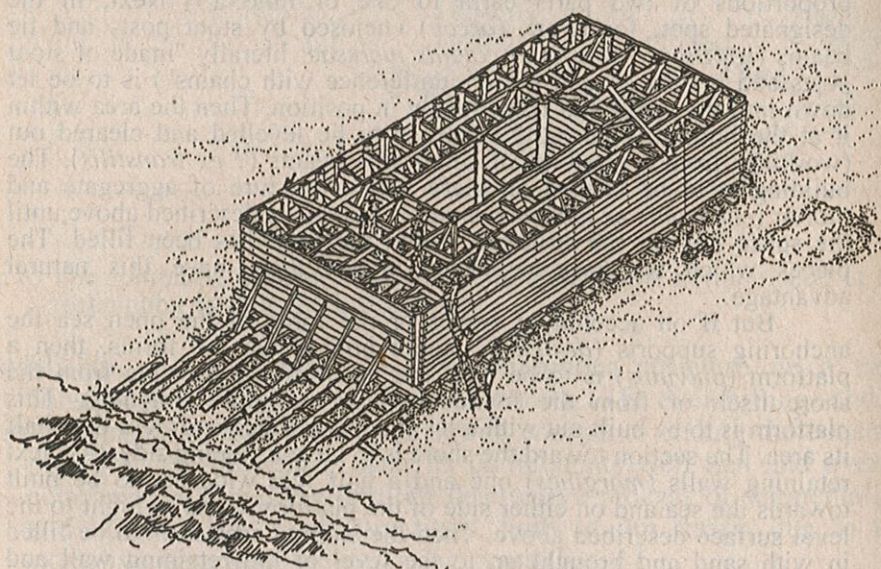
Artist rendering of the final phase of construction of wooden caisson K-2 on the sea shore, being filled with hydraulic cement to its lower third (C. Brandon).
